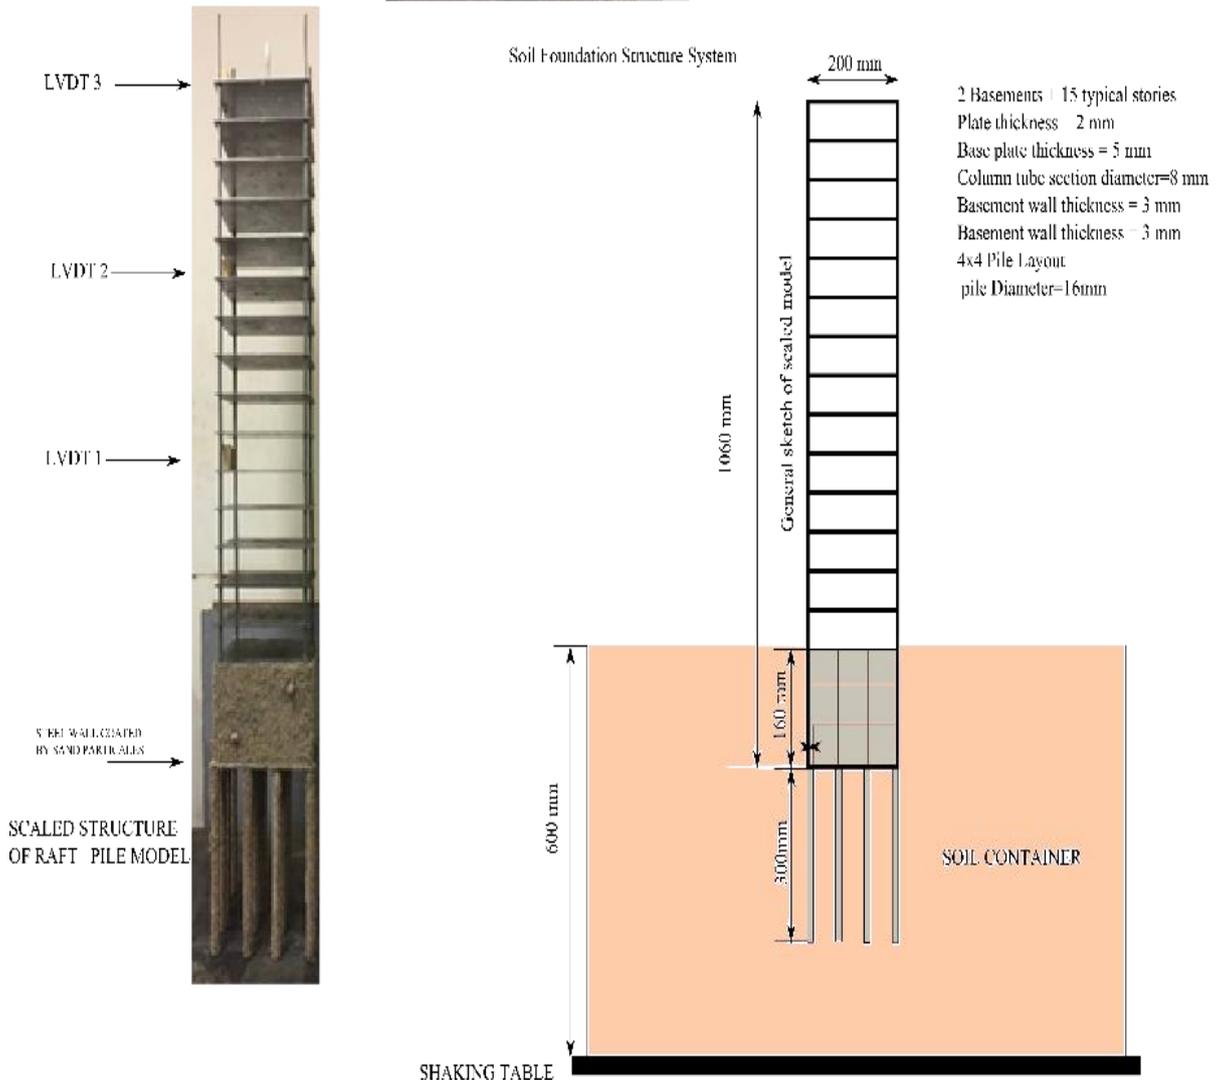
Soil foundation structure system details (raft on pile foundation)
